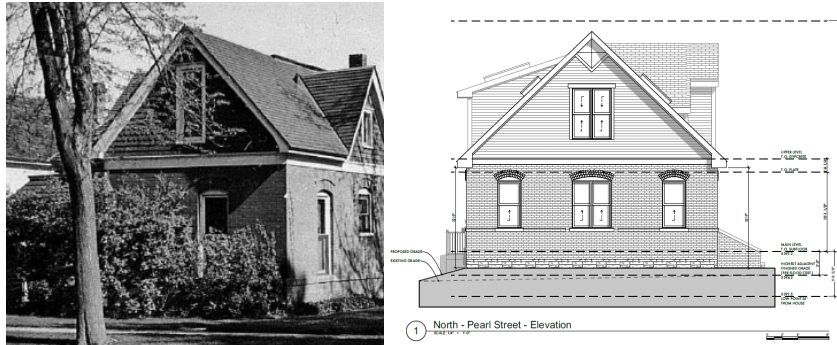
Detail of 1949 Photo of house (left) Proposed North (Pearl Street) Elevation (right). Not to scale.
